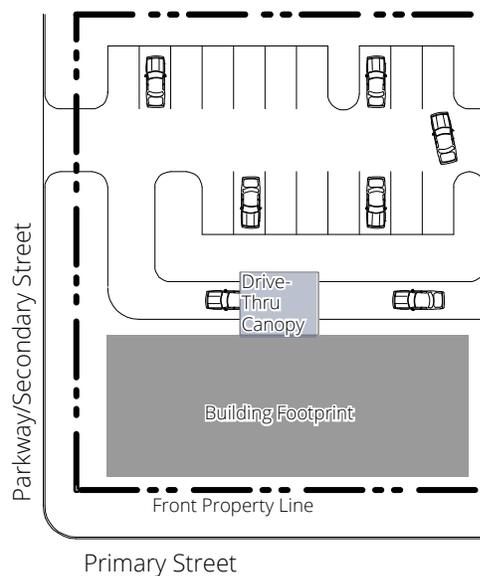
Recommended Drive-Through Facility Layout.
